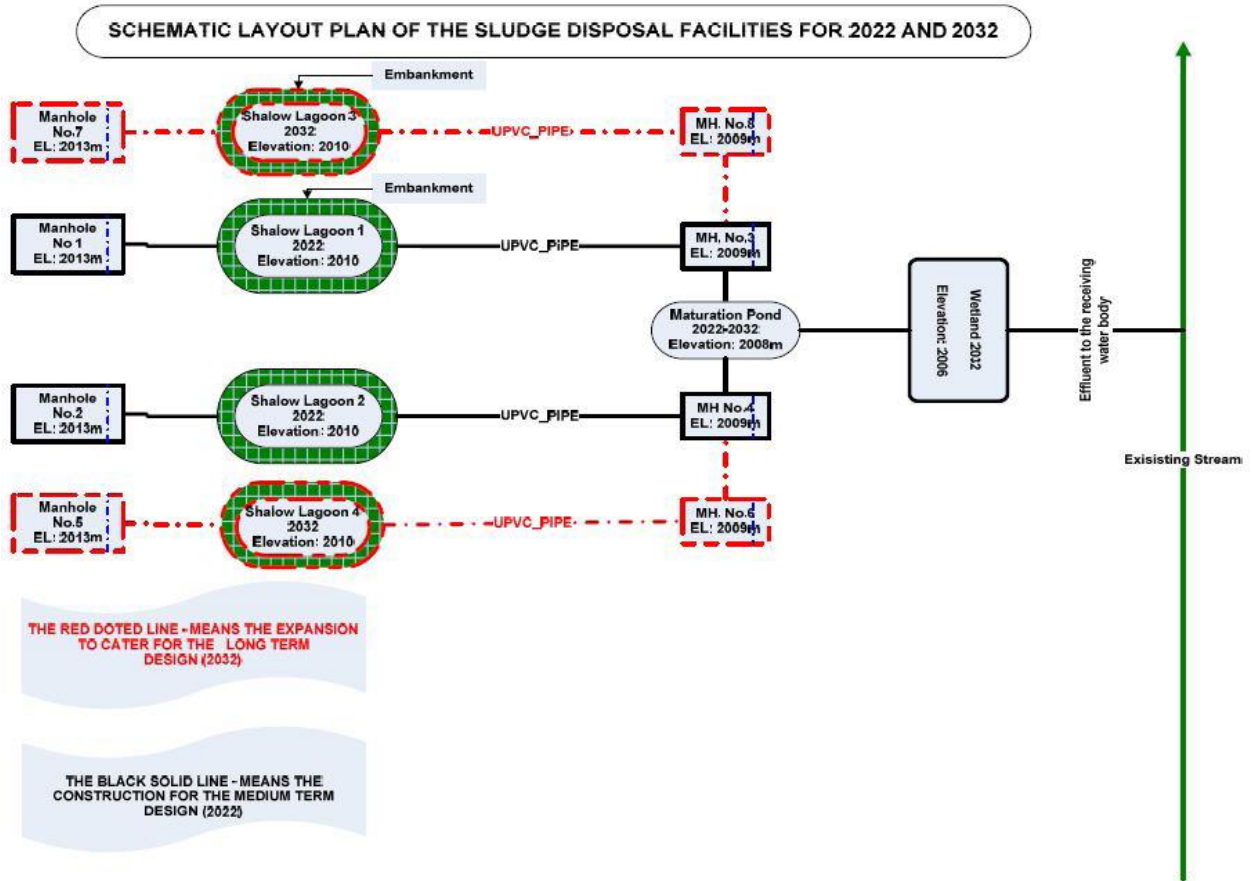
Schematic Layout Plan of Bukoba Sludge Disposal Facility
